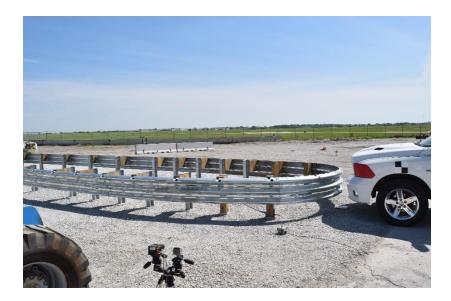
Test Installation Photos, System Overview, Test No. MSPBN-6
